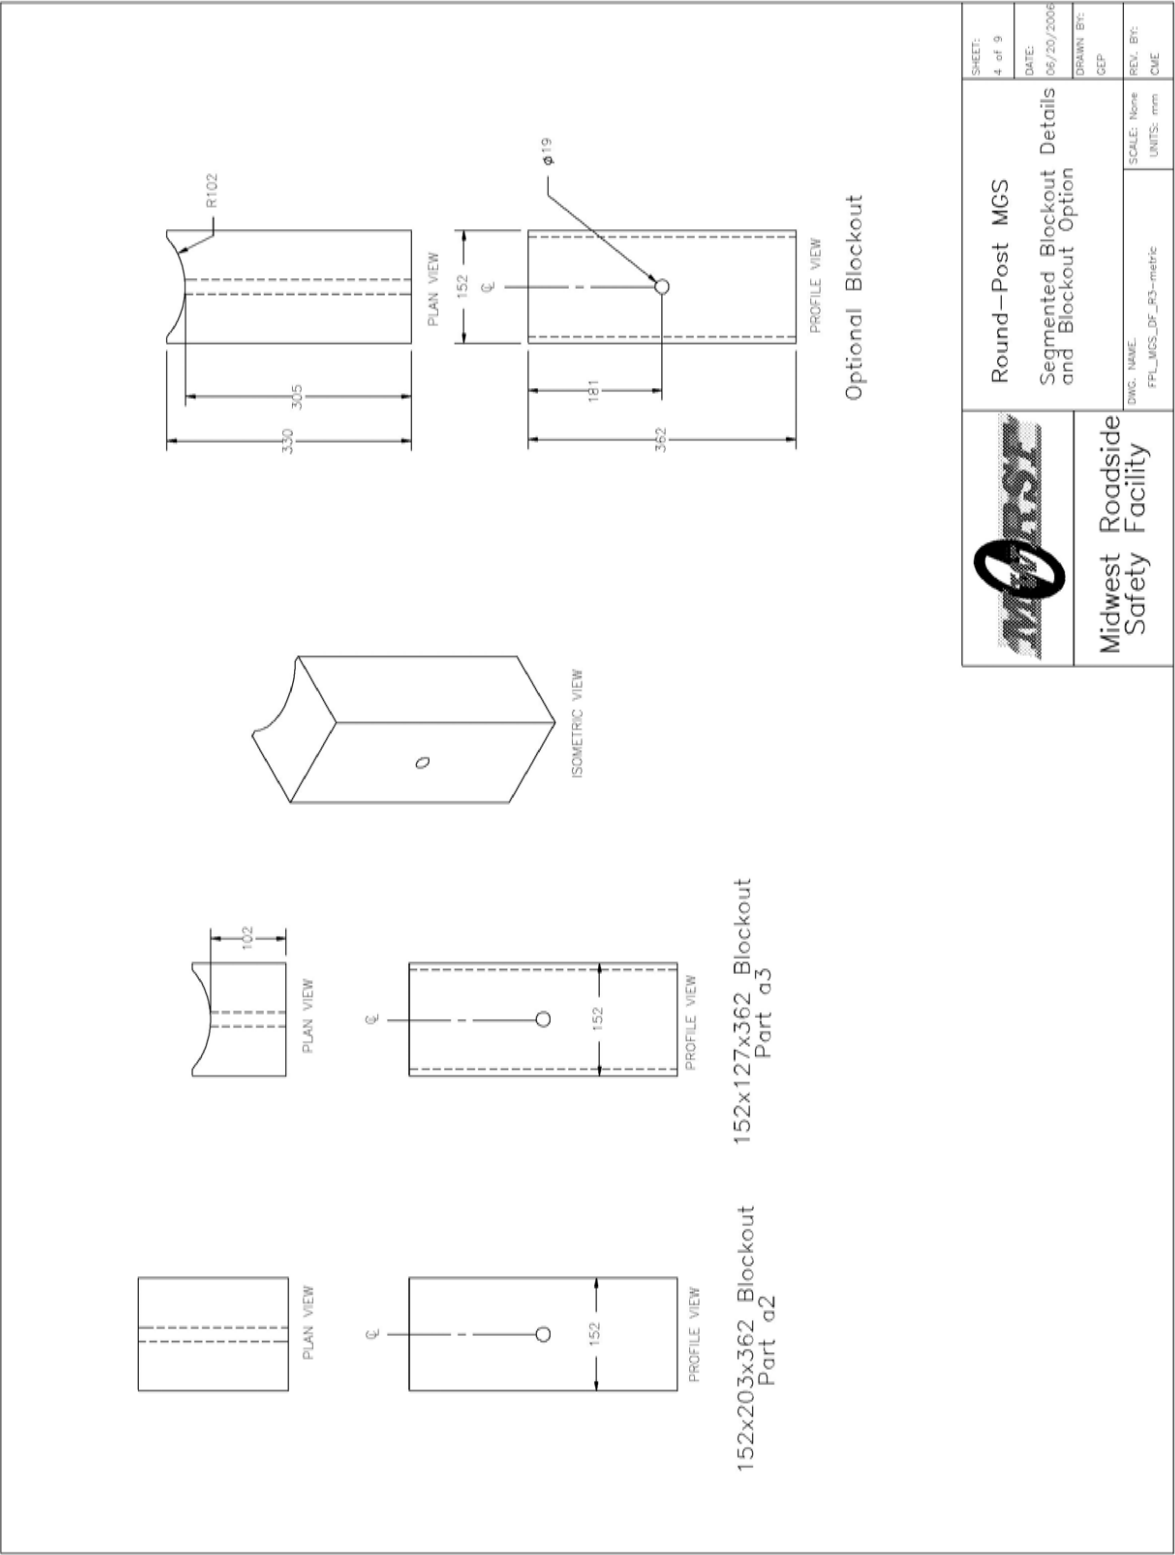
MGS Round Post Douglas Fir Details – Segmented blockout Detail
